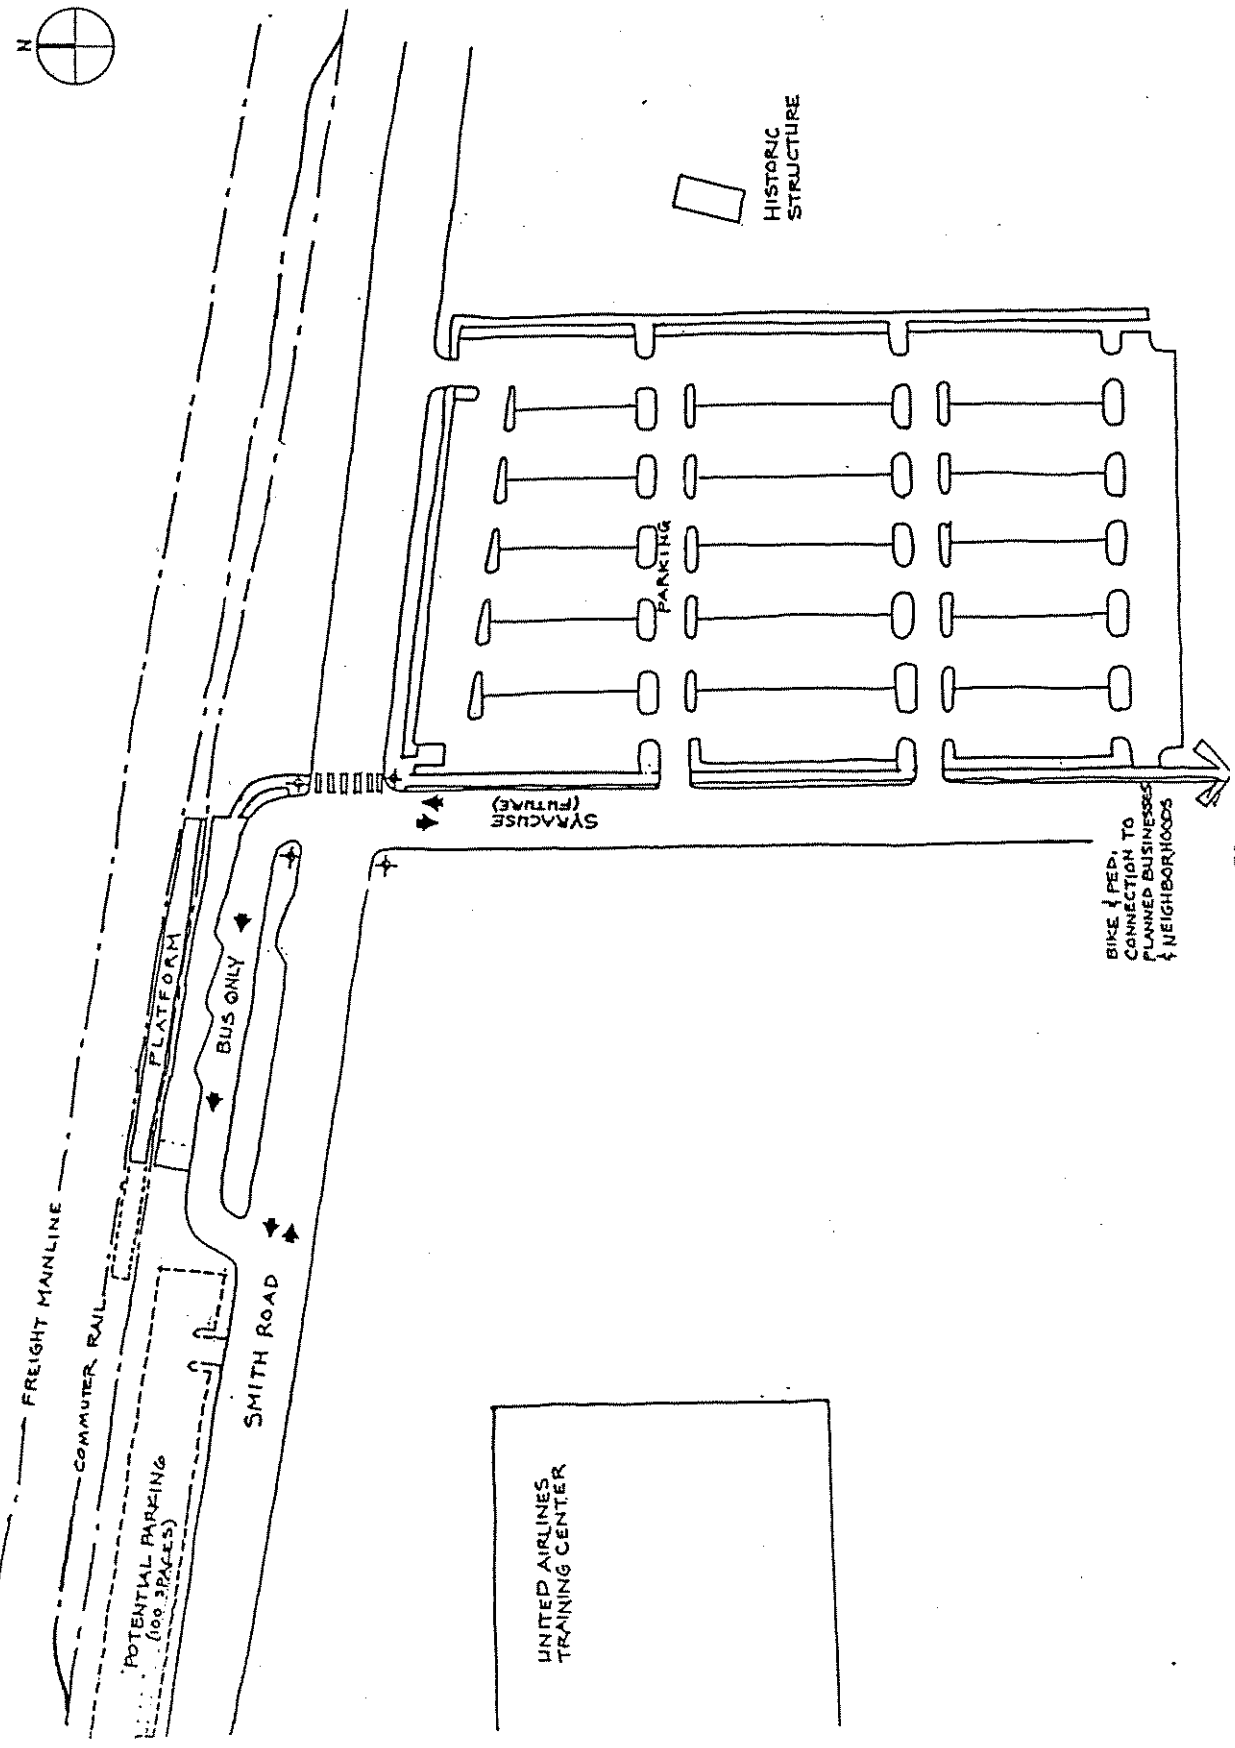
Gateway Commuter Rail Station Conceptual Plan
